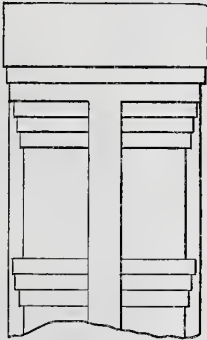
Front Chimney.—Scale, ½ Inch to the Foot.
